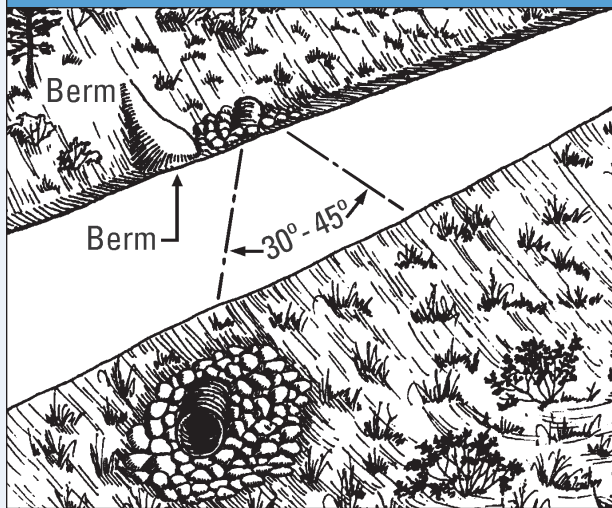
Cross-drain culvert. (Figure Credit: WDNR)
